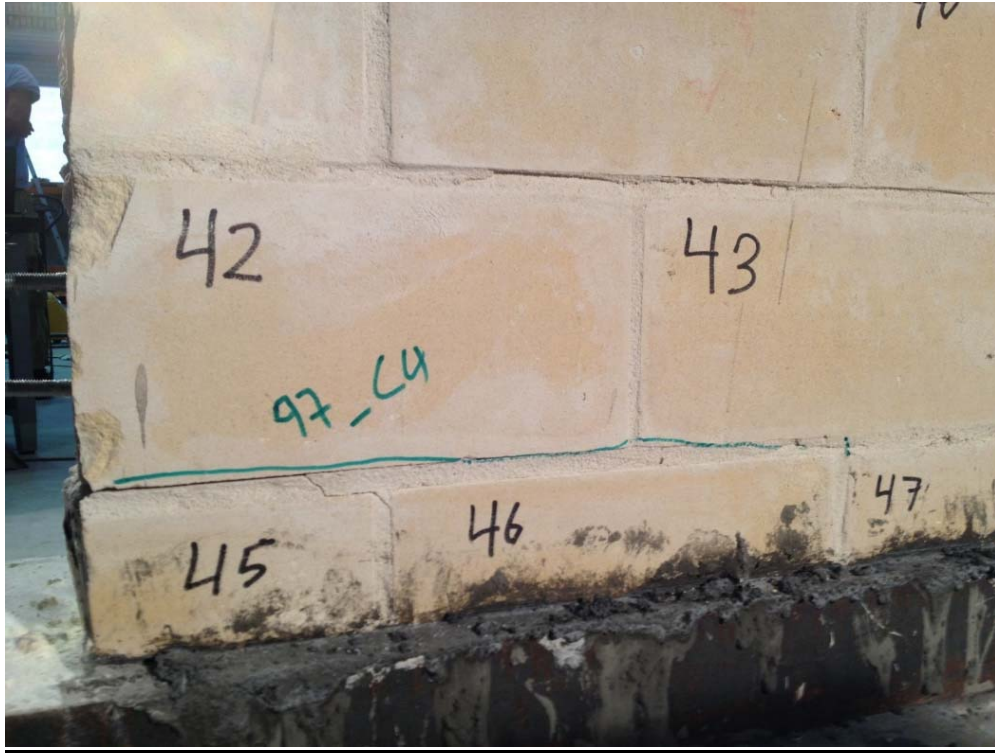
Damage associated with 2.4 mm pull loading Wall-1.7
